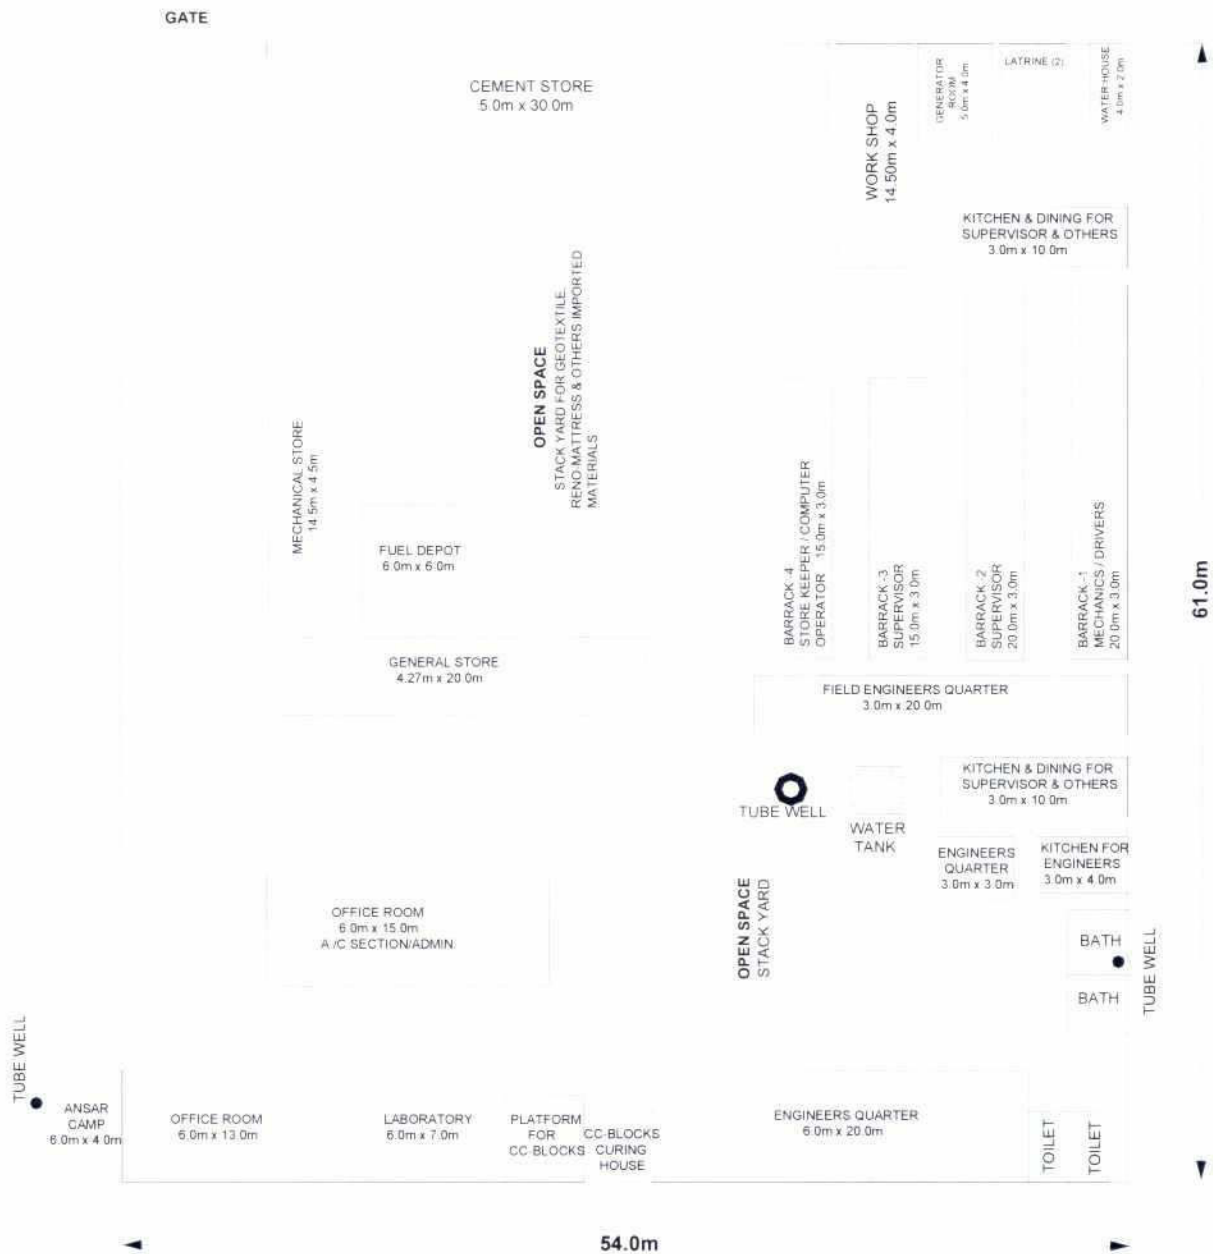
General Layout of Contractors Camp – Test Site I (Kamarjani)
